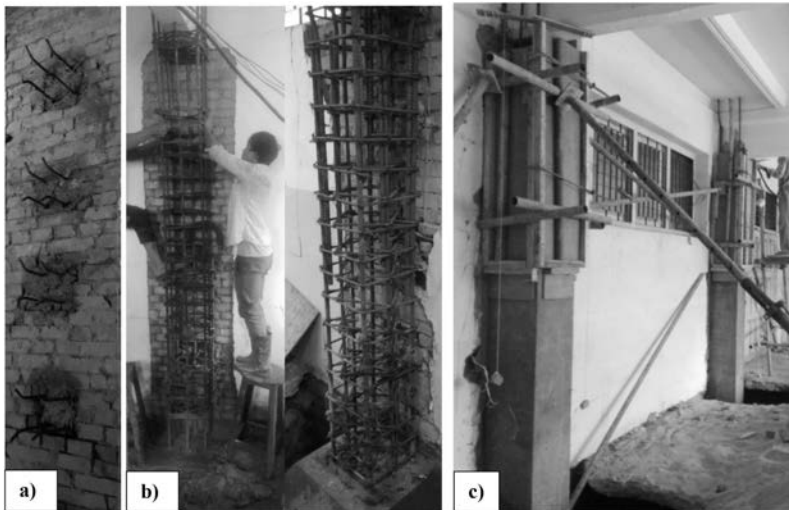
a) Shear-keys from the Brick Pier to combine RC Column b) Reinforcement in RC Column covering Shear Keys c) Concrete casting in Columns
